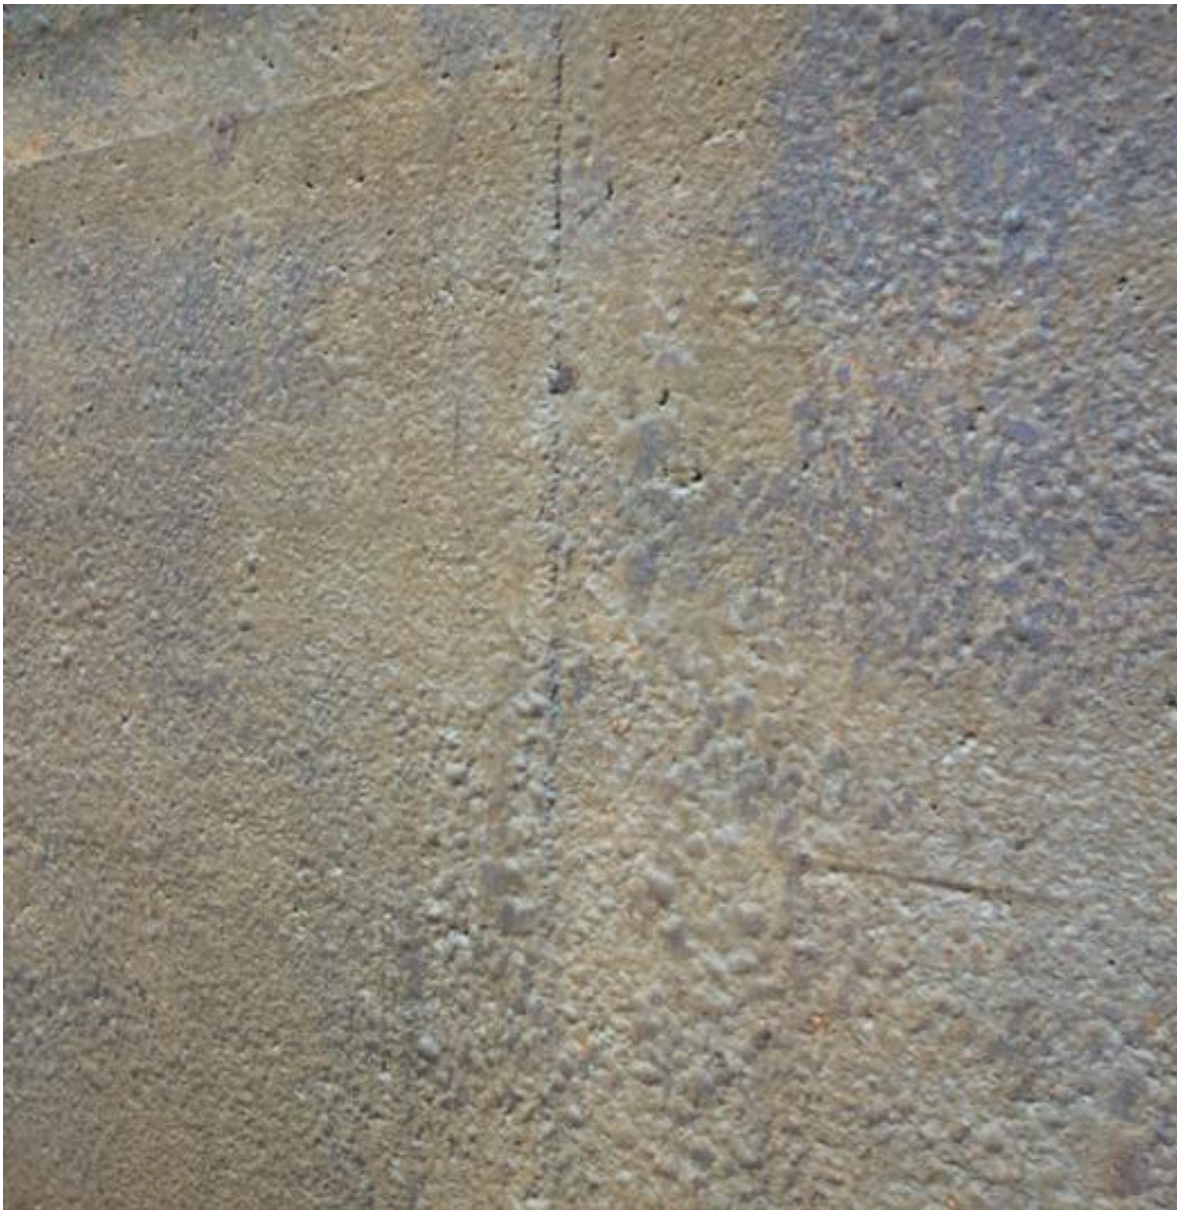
illustrates the sloping floor and East Wall of Grit Tank 2.
